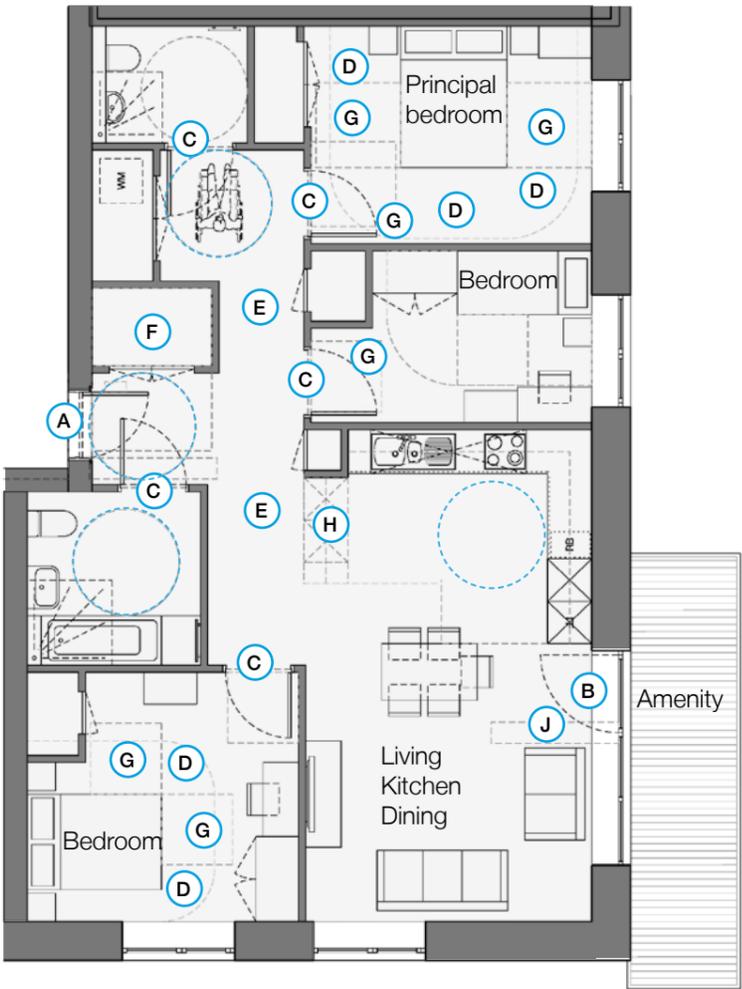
Typical 3 Bedroom 5 Persons accessible layout
